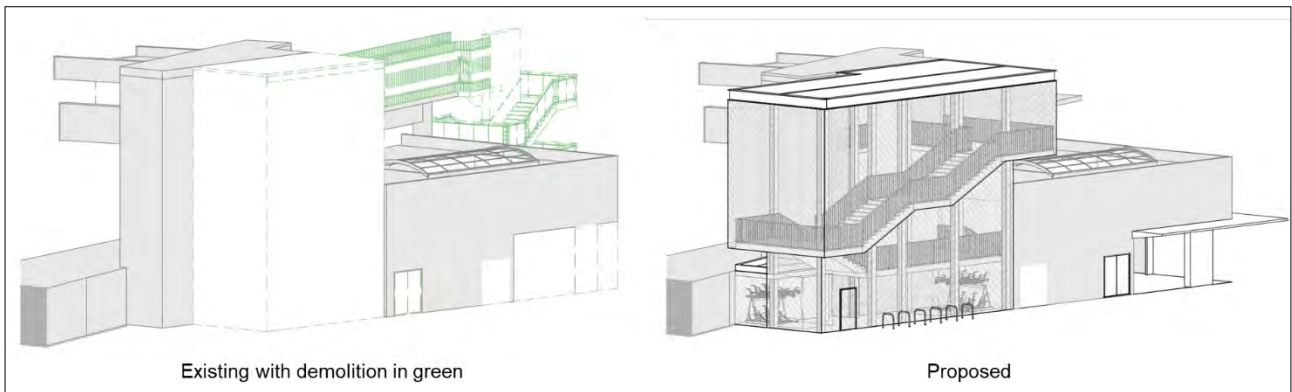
Kilbarrack Entrance - schematic of existing and proposed
